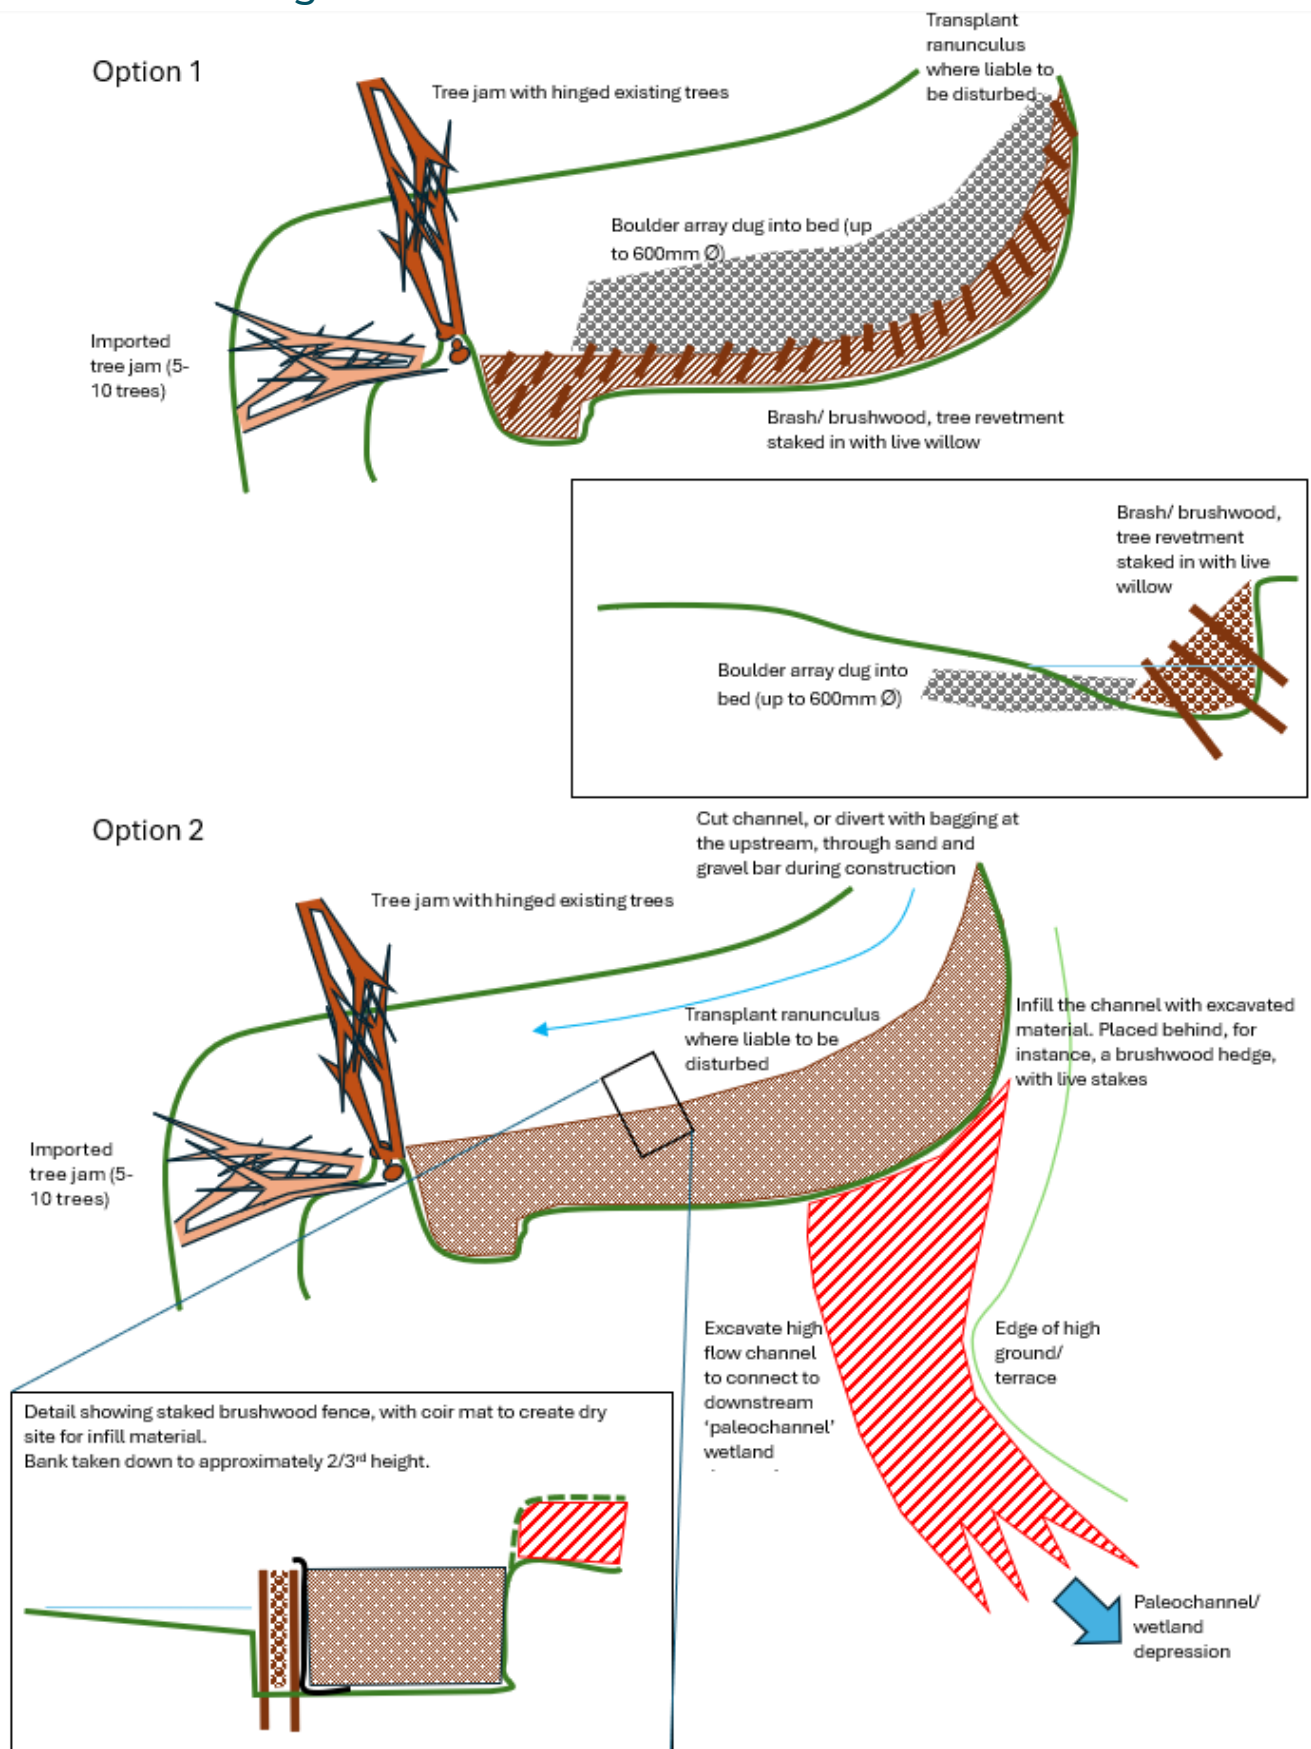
Detailed design drawing outlining the restoration works for Site 23.
